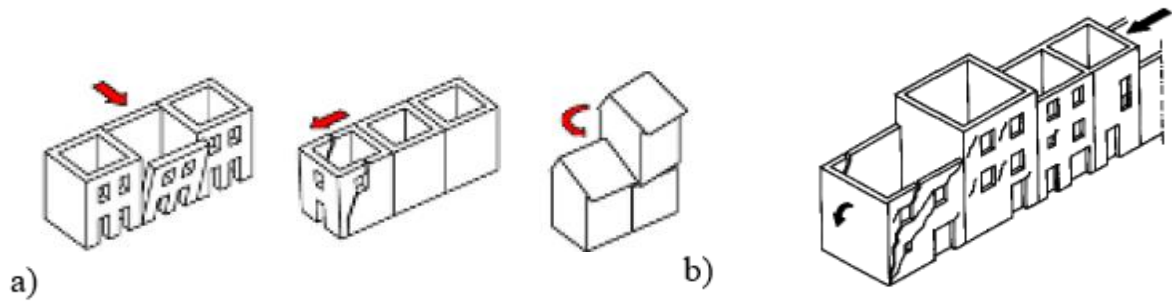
From left to right: a) examples of damage mechanisms due to interactions between adjacent buildings. b) damage of the outermost building in a row
